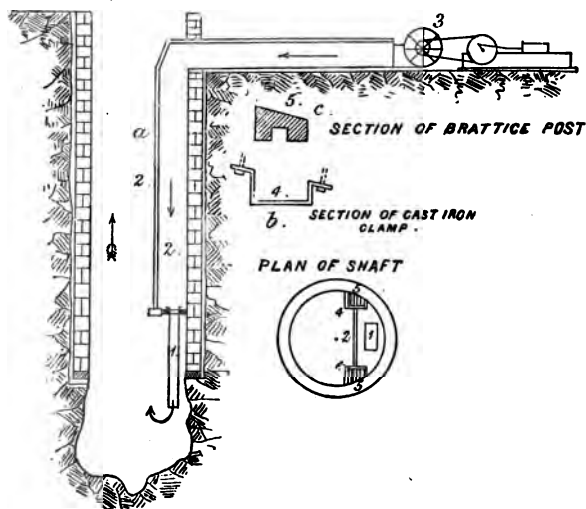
Bratticing of shaft. 1, air-pipe; 2, brattice boards; 3, fan; 4, iron clamp; 5, wood posts to hold boards.
